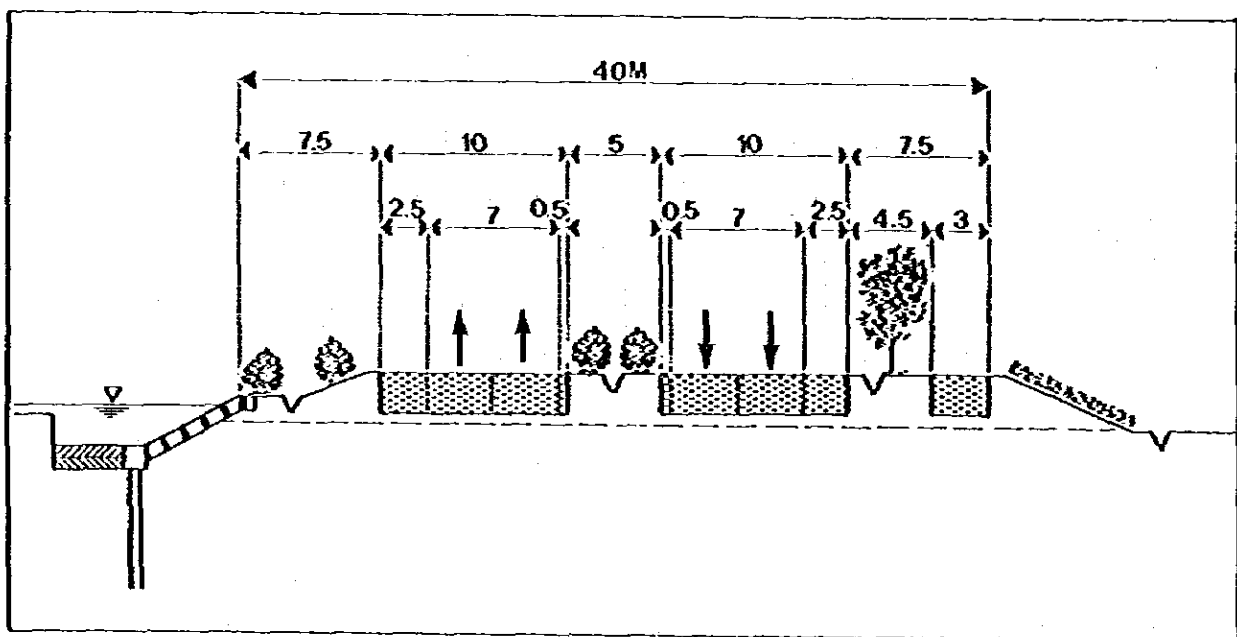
TYPICAL CROSS SECTION OF THE TOLL EXPRESSWAY ACCESS ROAD
